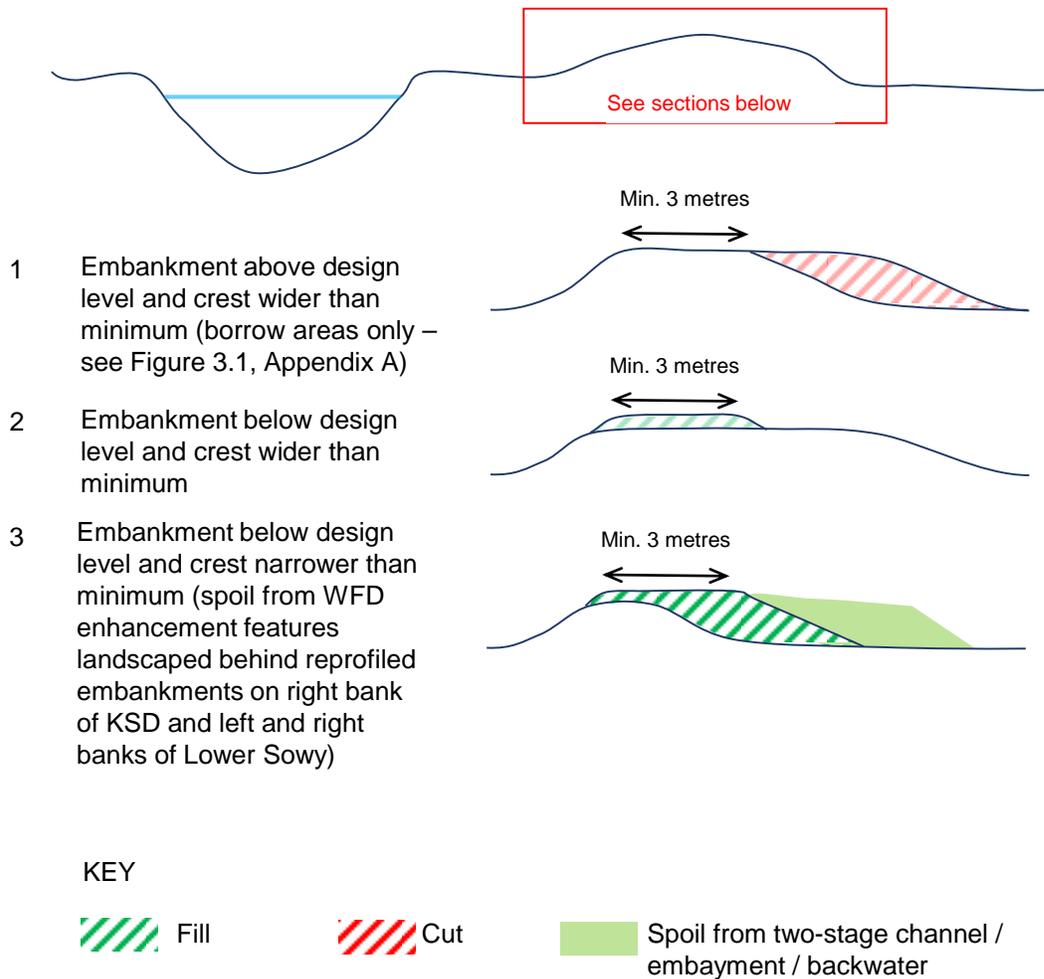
Schematic illustration of bank reprofiling process to achieve a minimum 3m crest width
